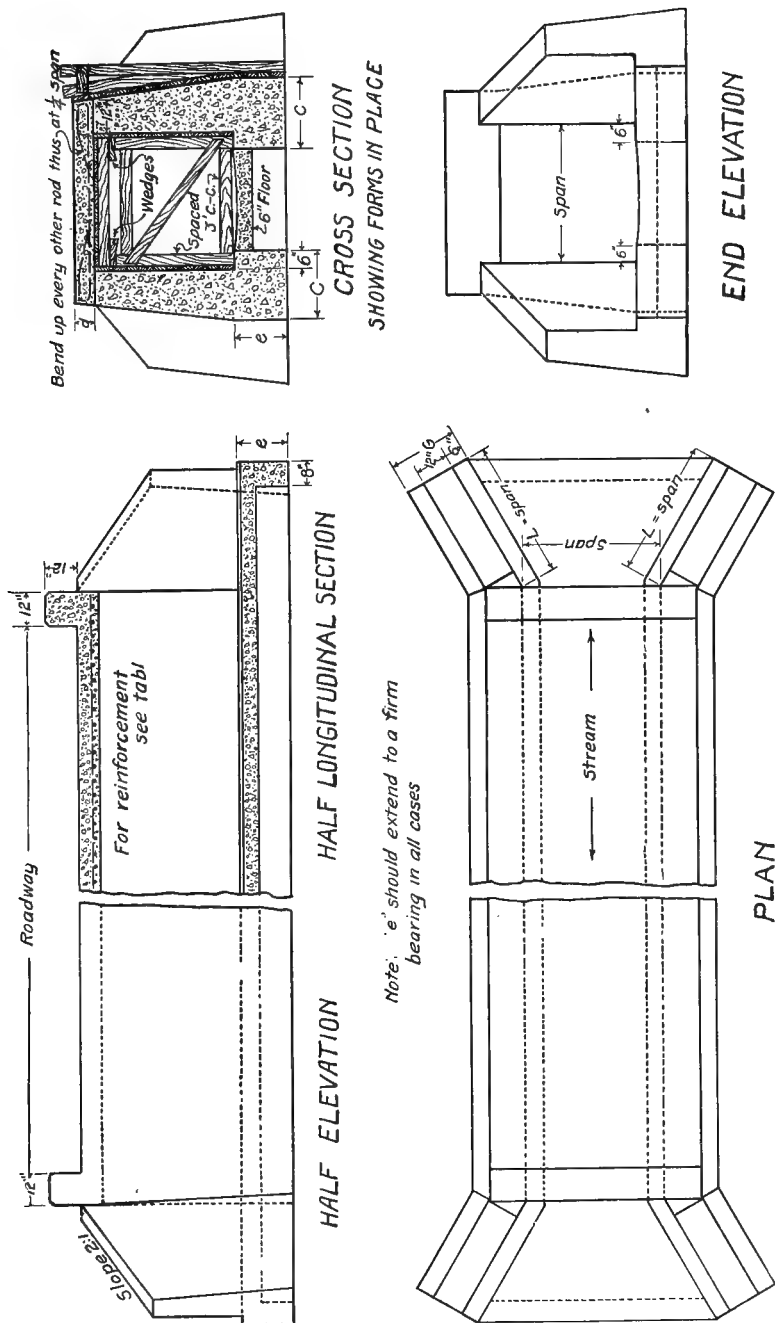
Typical Design. Reinforced Box Culvert, 3 to 10 feet in span.
